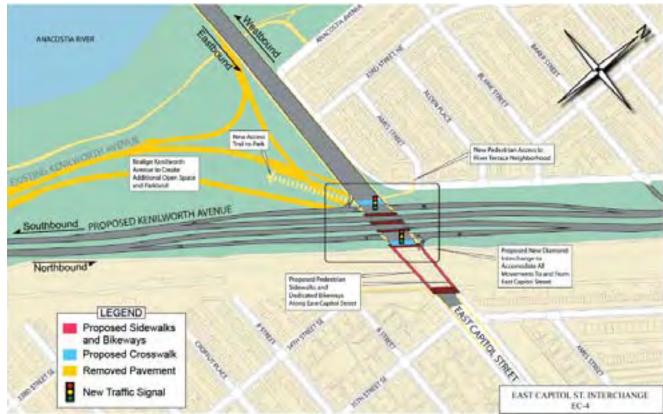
East Capitol Street Improvement Scenario EC-4
